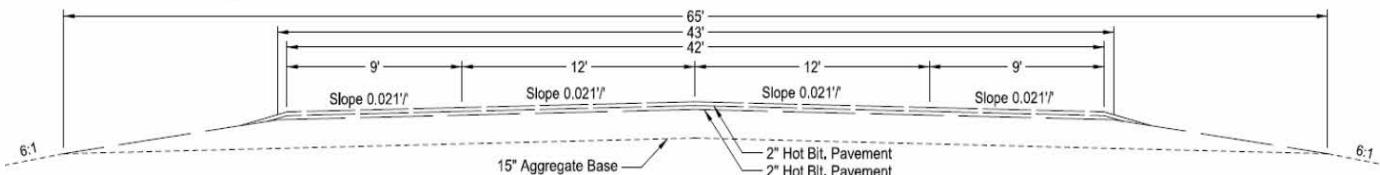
Existing Typical Section RP 148.879 to 149.583
